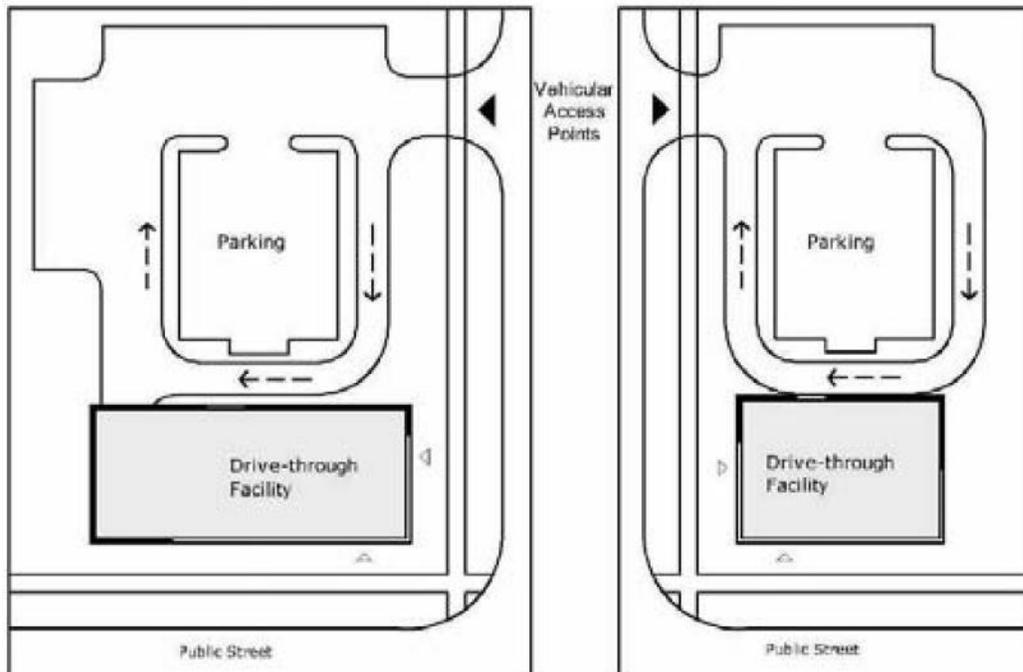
Example shows preferred design on a street corner; note the building is the prominent feature on the street corner with parking and drive-through lane secondary and behind the structures. Landscaping and screening berm/wall would obscure drive-through lanes that are parallel to the abutting secondary street.
